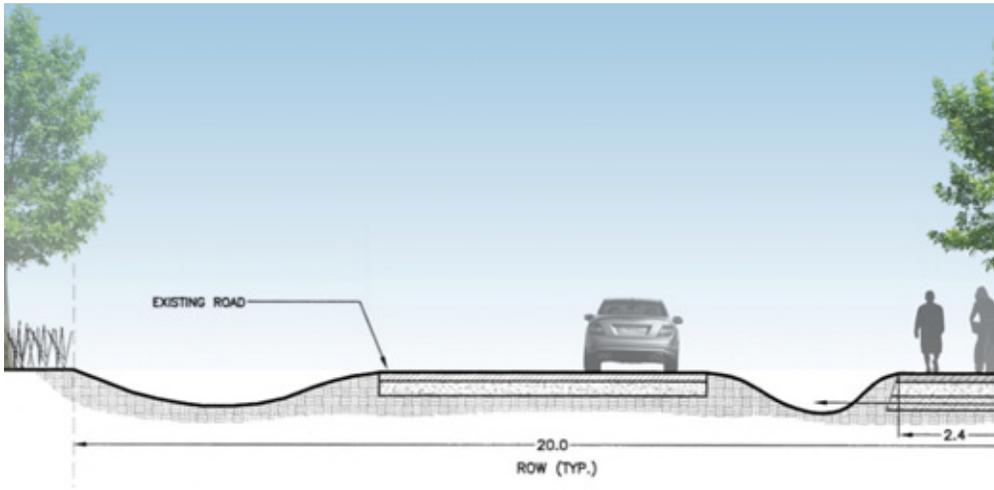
Cross Section of Rural Road with Separate Bike Path or Multi-Use Trail
